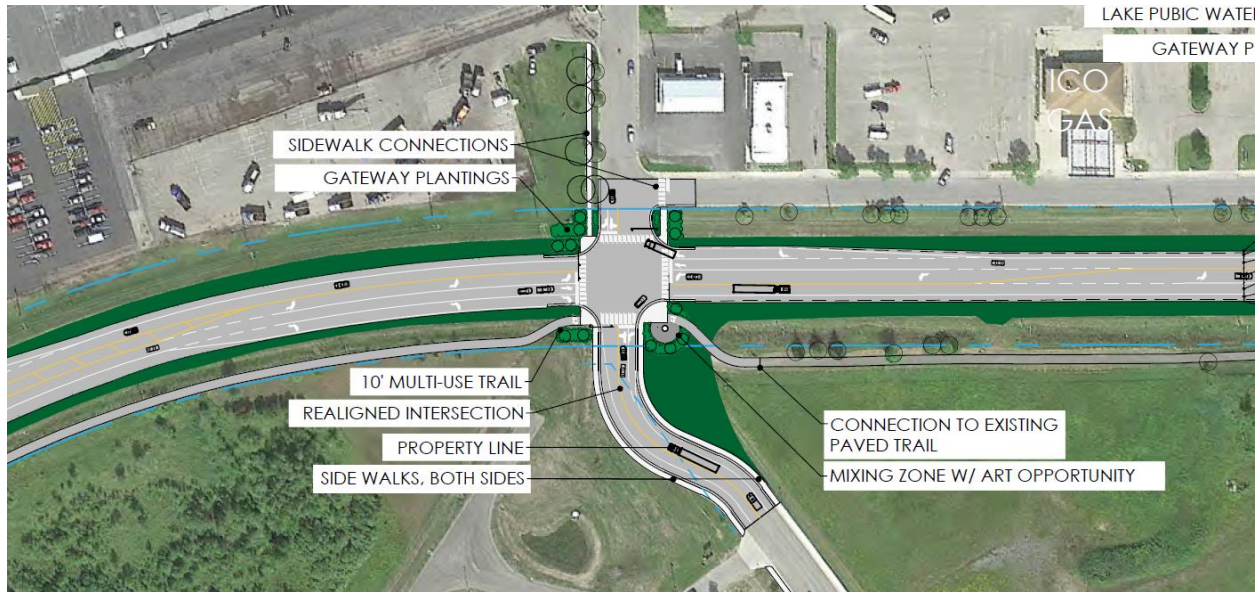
Example of proposed changes to enhance safety at an existing skewed intersection
